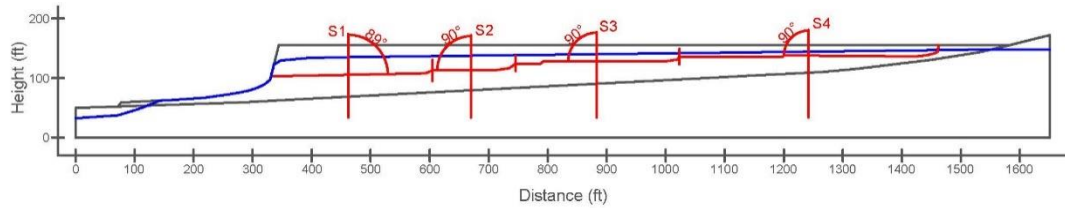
Sub-sectioning of the cross-section and failure plane for El Cobre Tailings Dam
